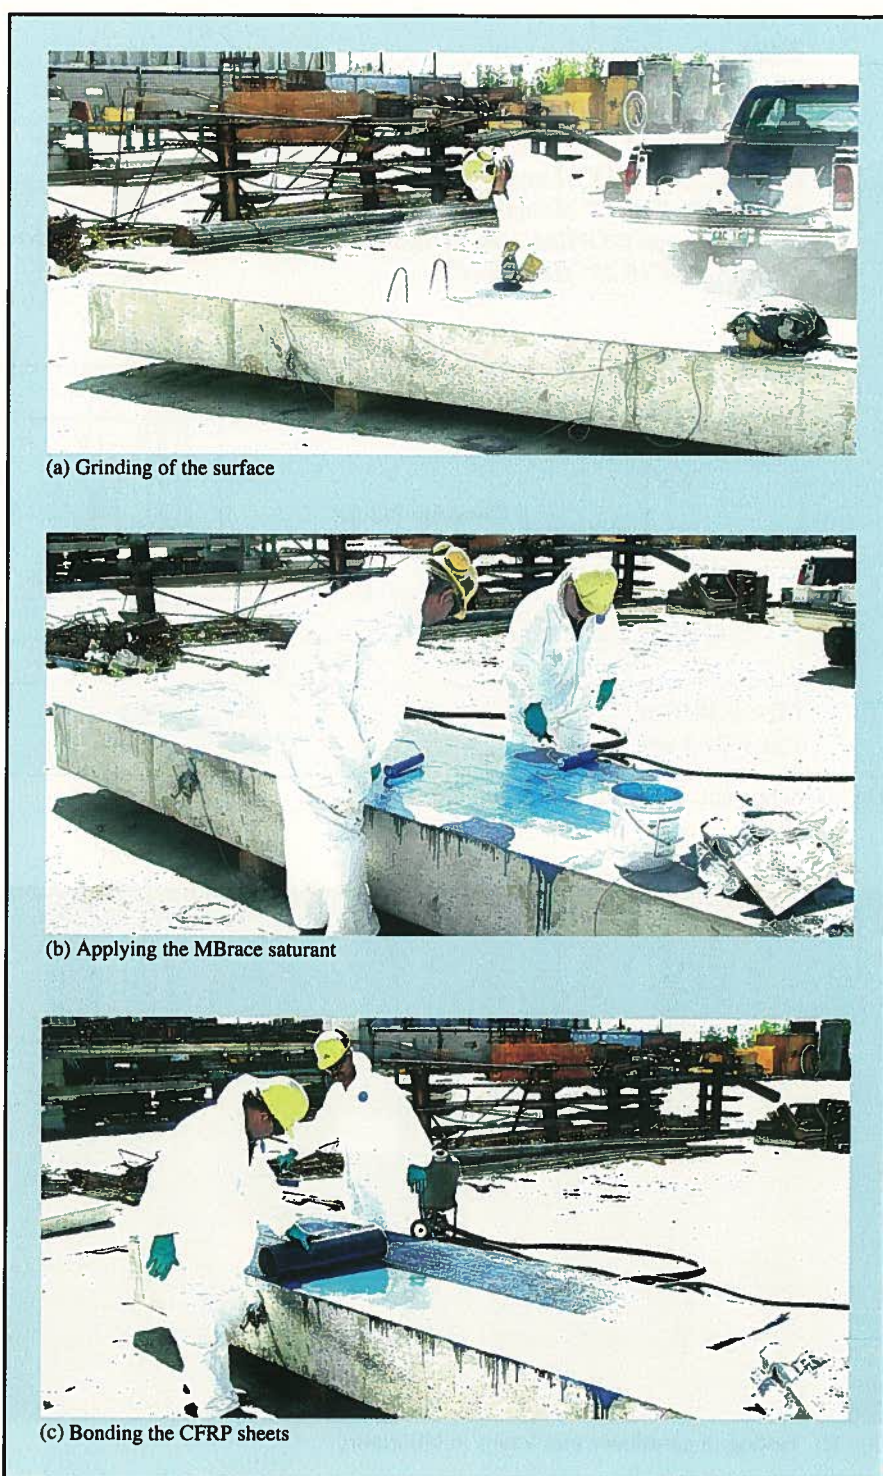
Installation procedures for externally bonded CFRP sheets.
